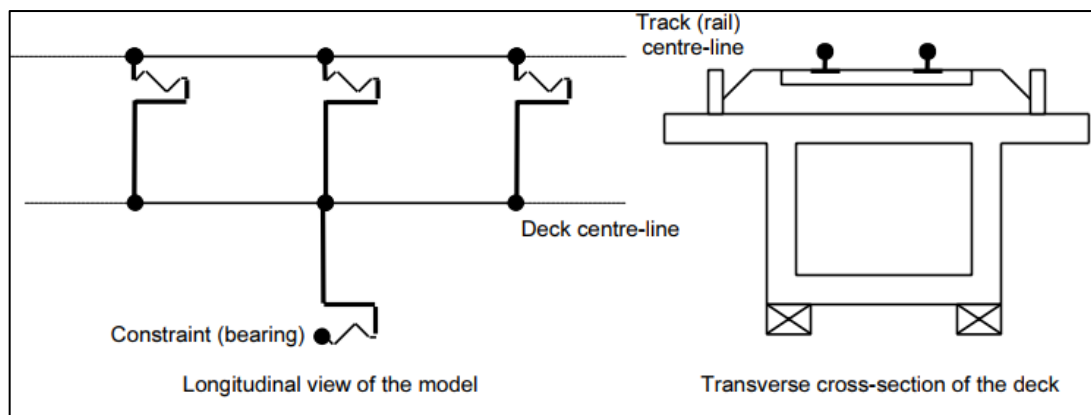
Typical Model of Rail-Deck-Bearing UIC
